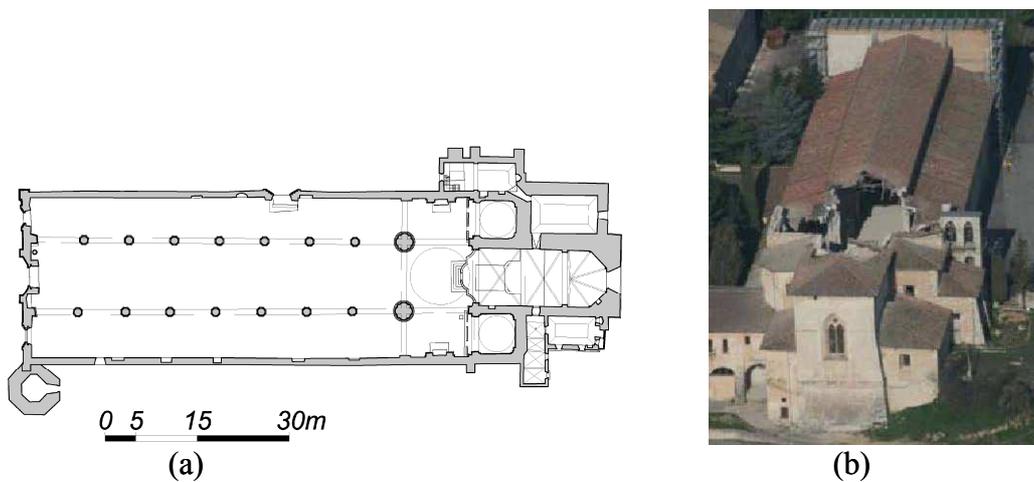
St. Maria di Collemaggio church: plan (a); collapse at transept (b)
